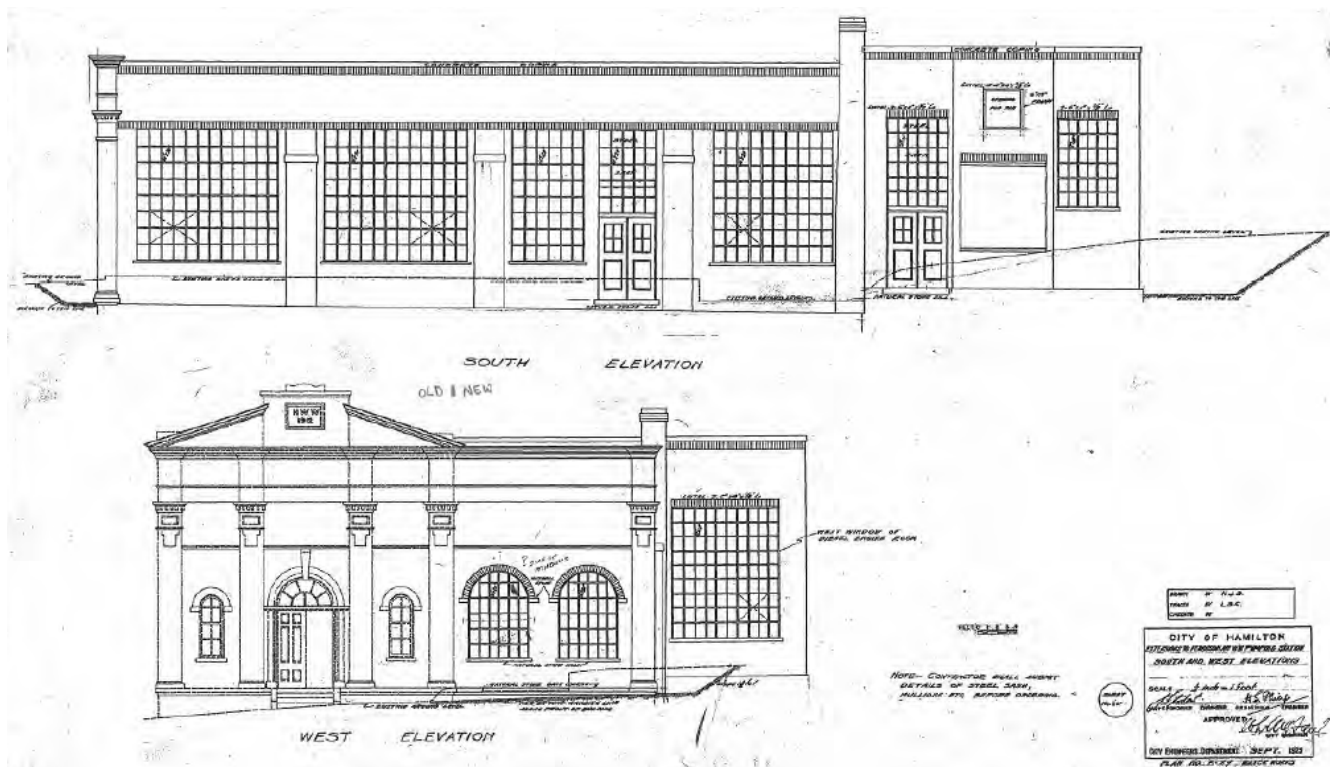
South and west elevations of the Ferguson Avenue Pumping Station showing the 1929-1930 extension.
